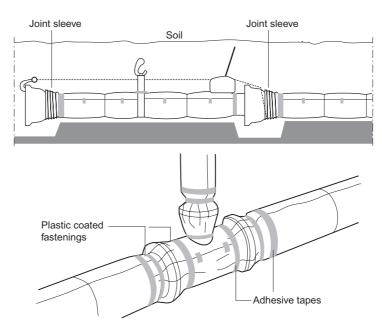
Protection of pipes and joints (Pont-a-Mousson, 1992).
